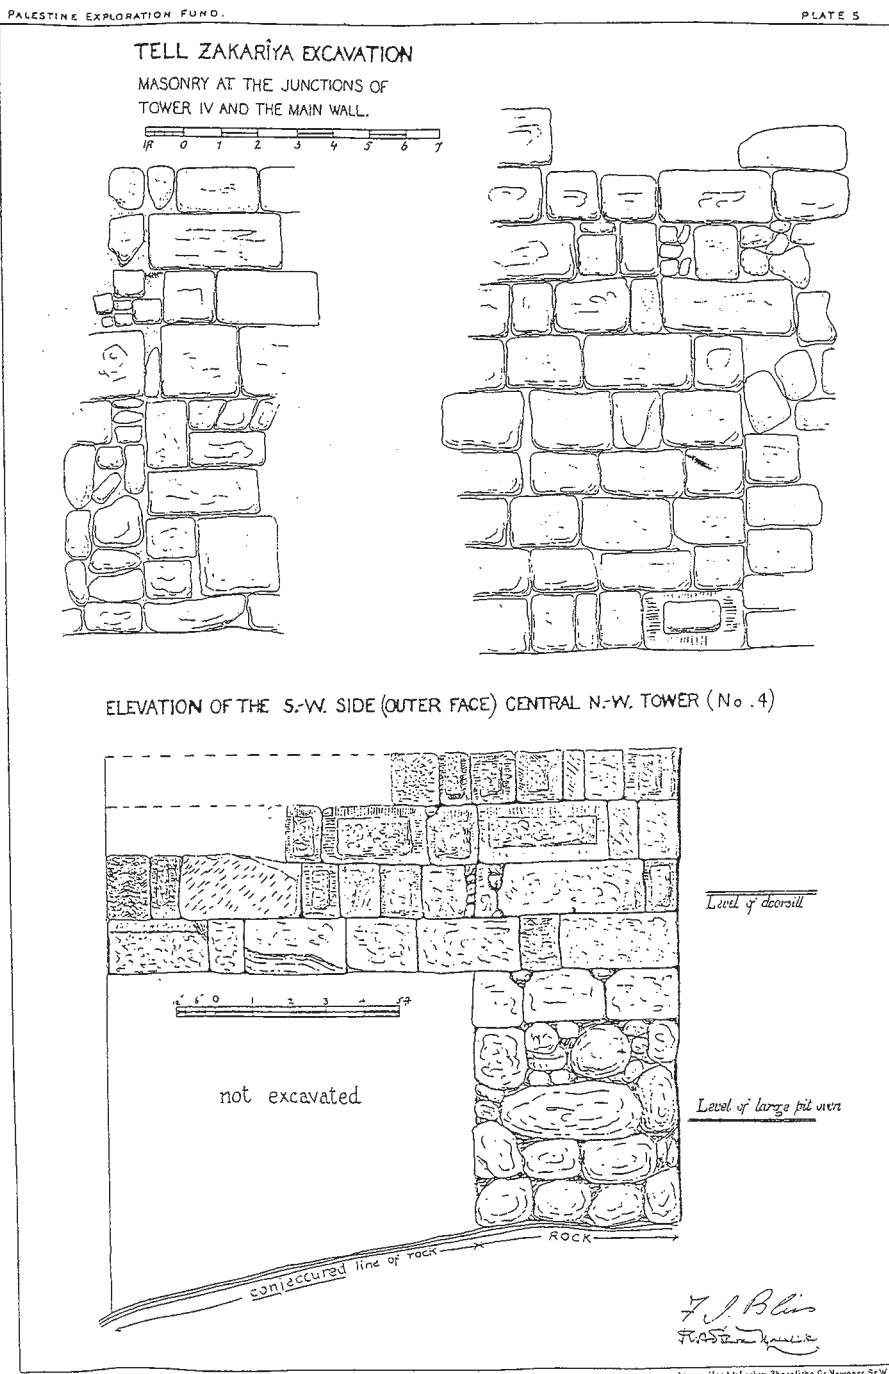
Upper: Drawing of the joint of the foundations of the main wall with Tower IV (Bliss and Macalister 1902: Pl. 5, upper). Lower: Drawing of the foundation wall of Tower IV (Bliss and Macalister 1902: Pl. 5, lower).
